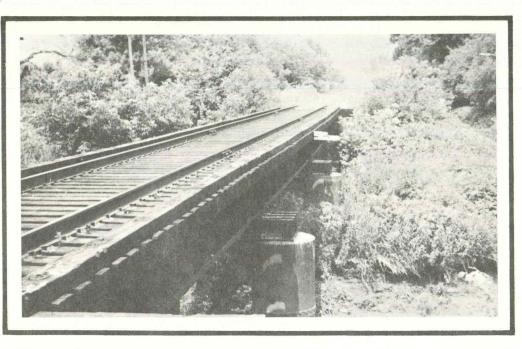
Downstream side of C.R.I.&P. RR bridge at mile 9.62 (West Branch), looking north.
